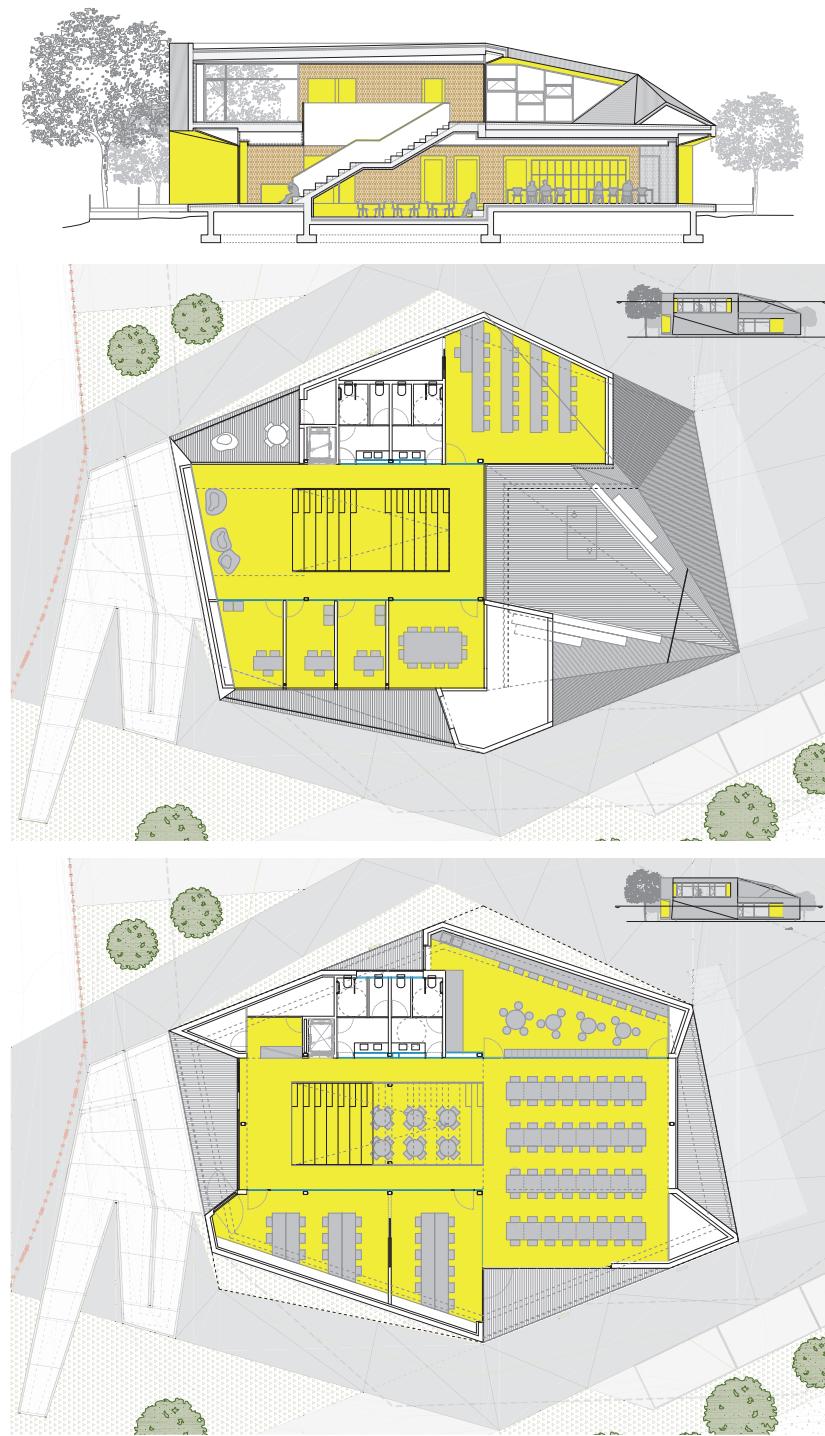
Plants and longitudinal section. Crystalzoo Archive © (2019) / Figura 6. Plantas y sección longitudinal. Archivo Crystalzoo© (2019).
